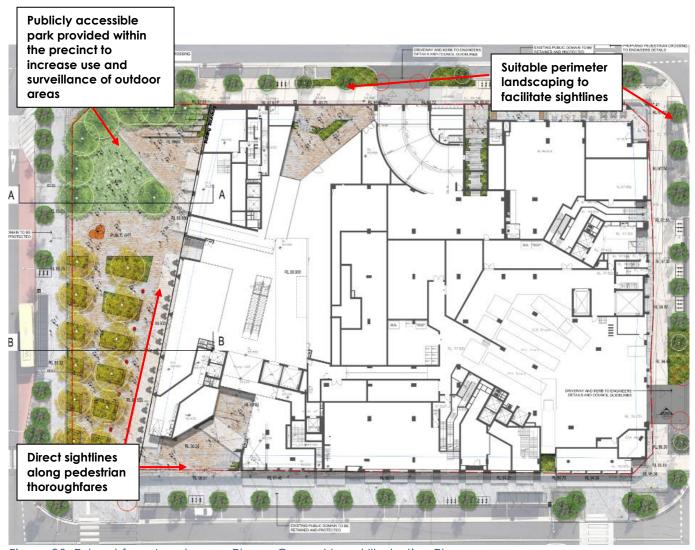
Extract from Landscape Plans - Ground Level Illustrative Plan
